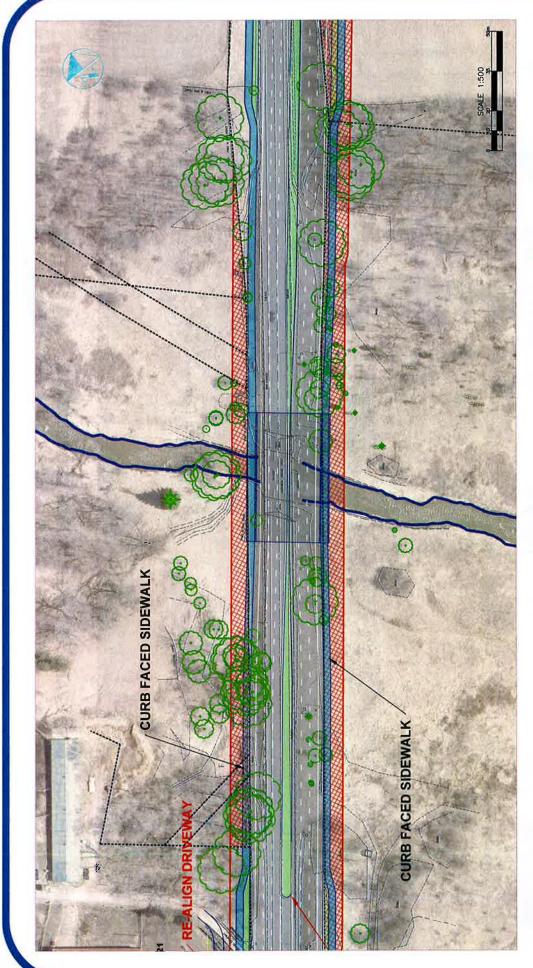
CURB FACED SIDEWALK AT CROSSING #7 NOVEMBER 27, 2013
